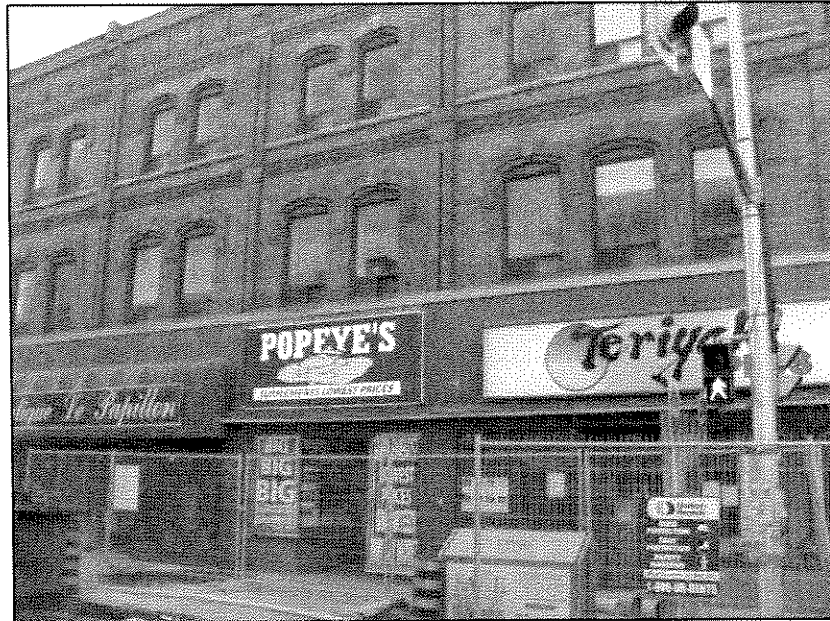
View of 132-138 Bank Street heritage building from Bank Street..
